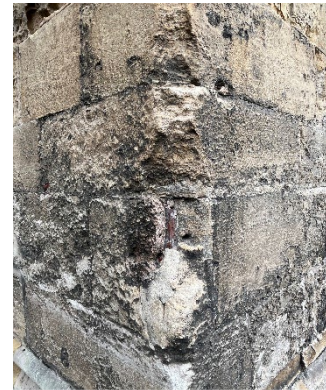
Eroded limestone, Minster's facade (Author's Own, 2024)
